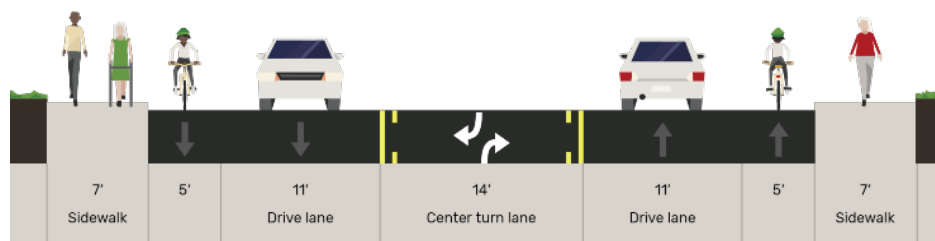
U.S. 101 Cross Section – Two Travel Lanes (60-foot right-of-way)
